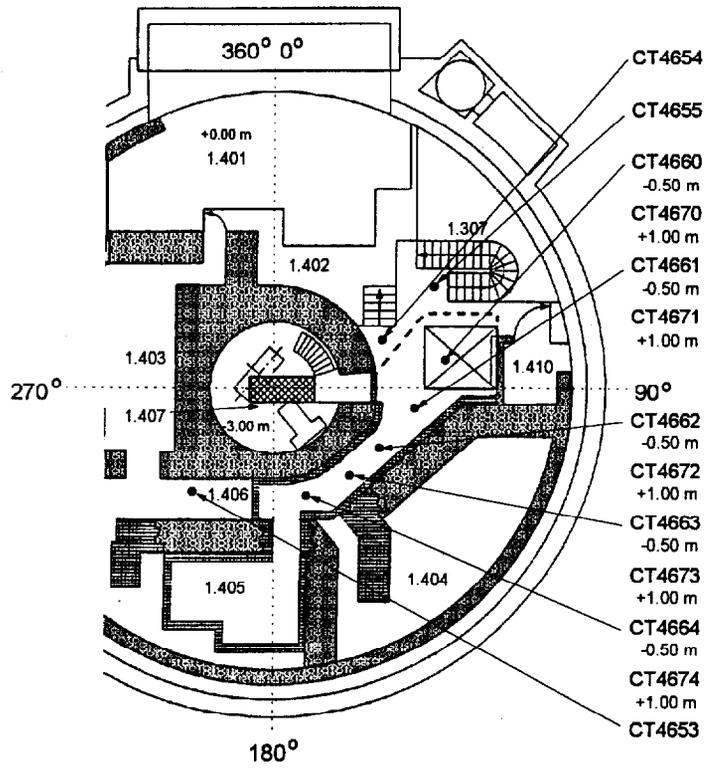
Level 1.400 TC's at the +0.0 m Elevation for T51.2
